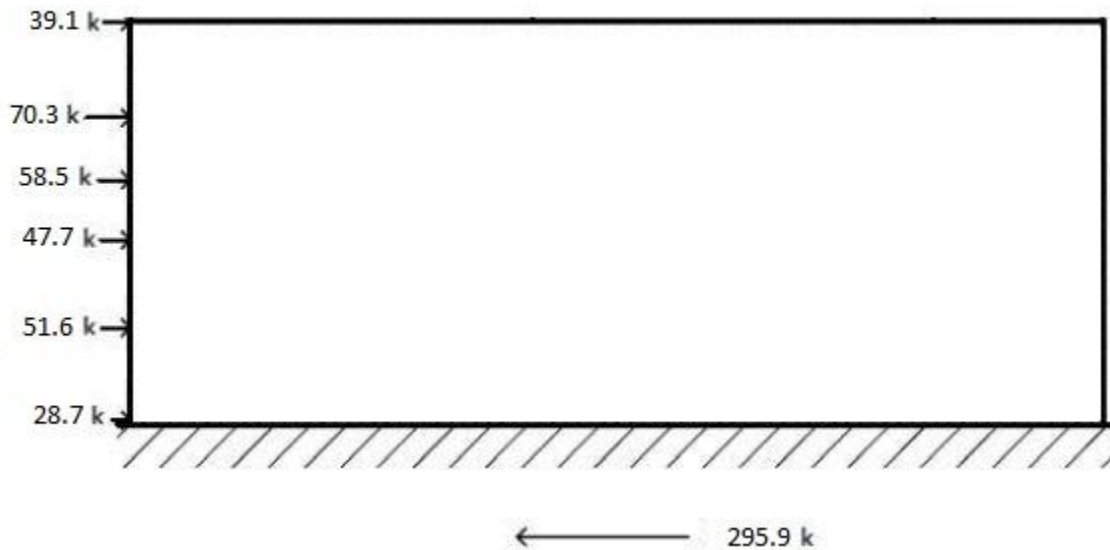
Wind Forces acting at each floor level on the East Wing, North and South facades
